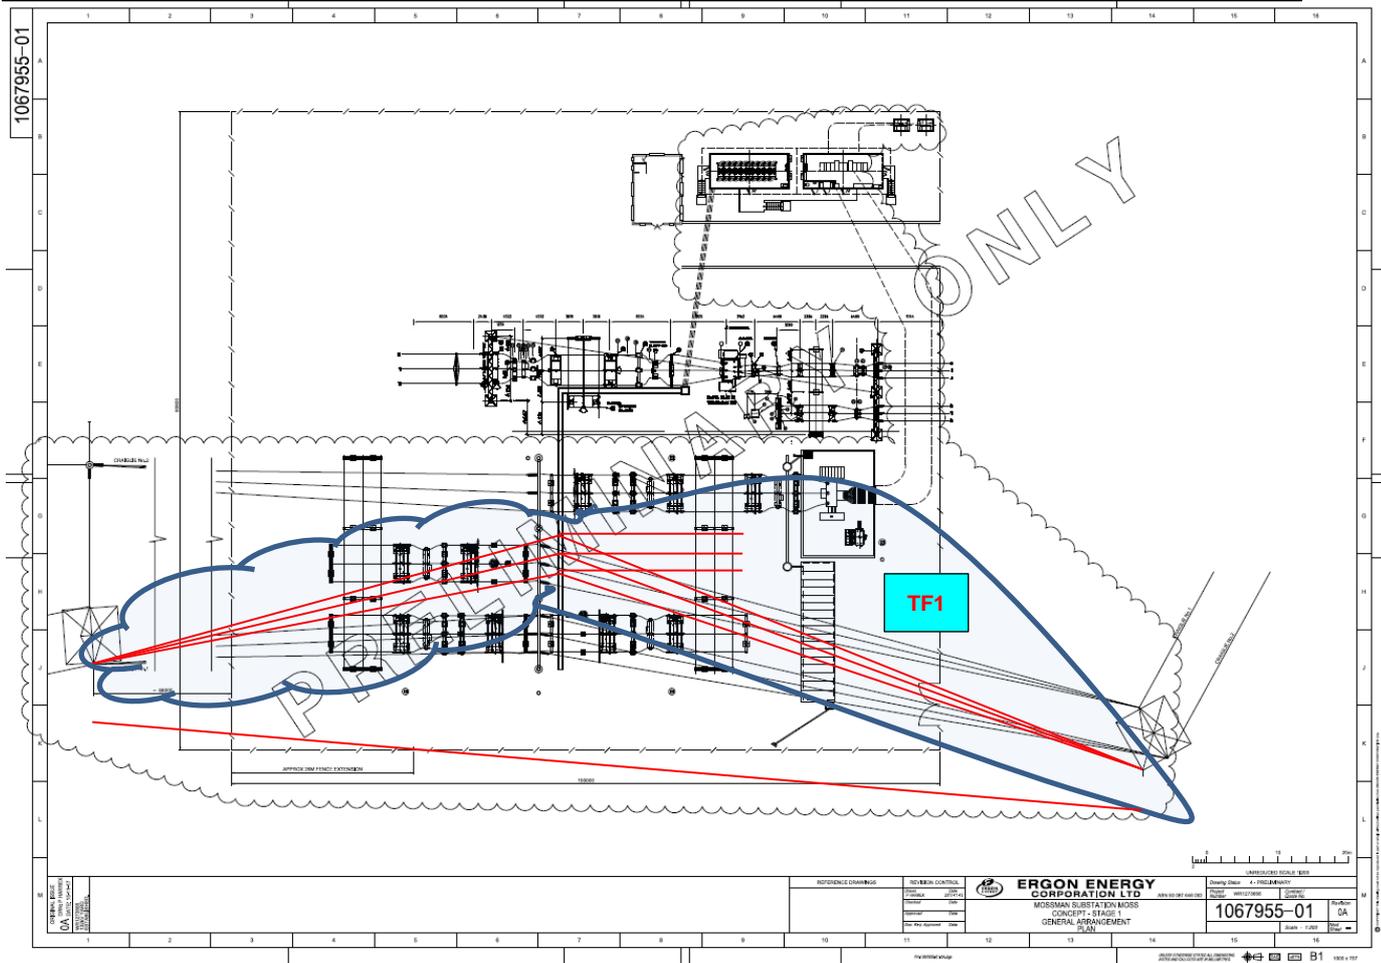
Stage 2a: General Arrangement with Proposed 132 kV Substation Overlay to be modified to include only a single landing span from re-directed 7201/2 and 132 kV bus tee to TF1 132/22 kV OLTC.
